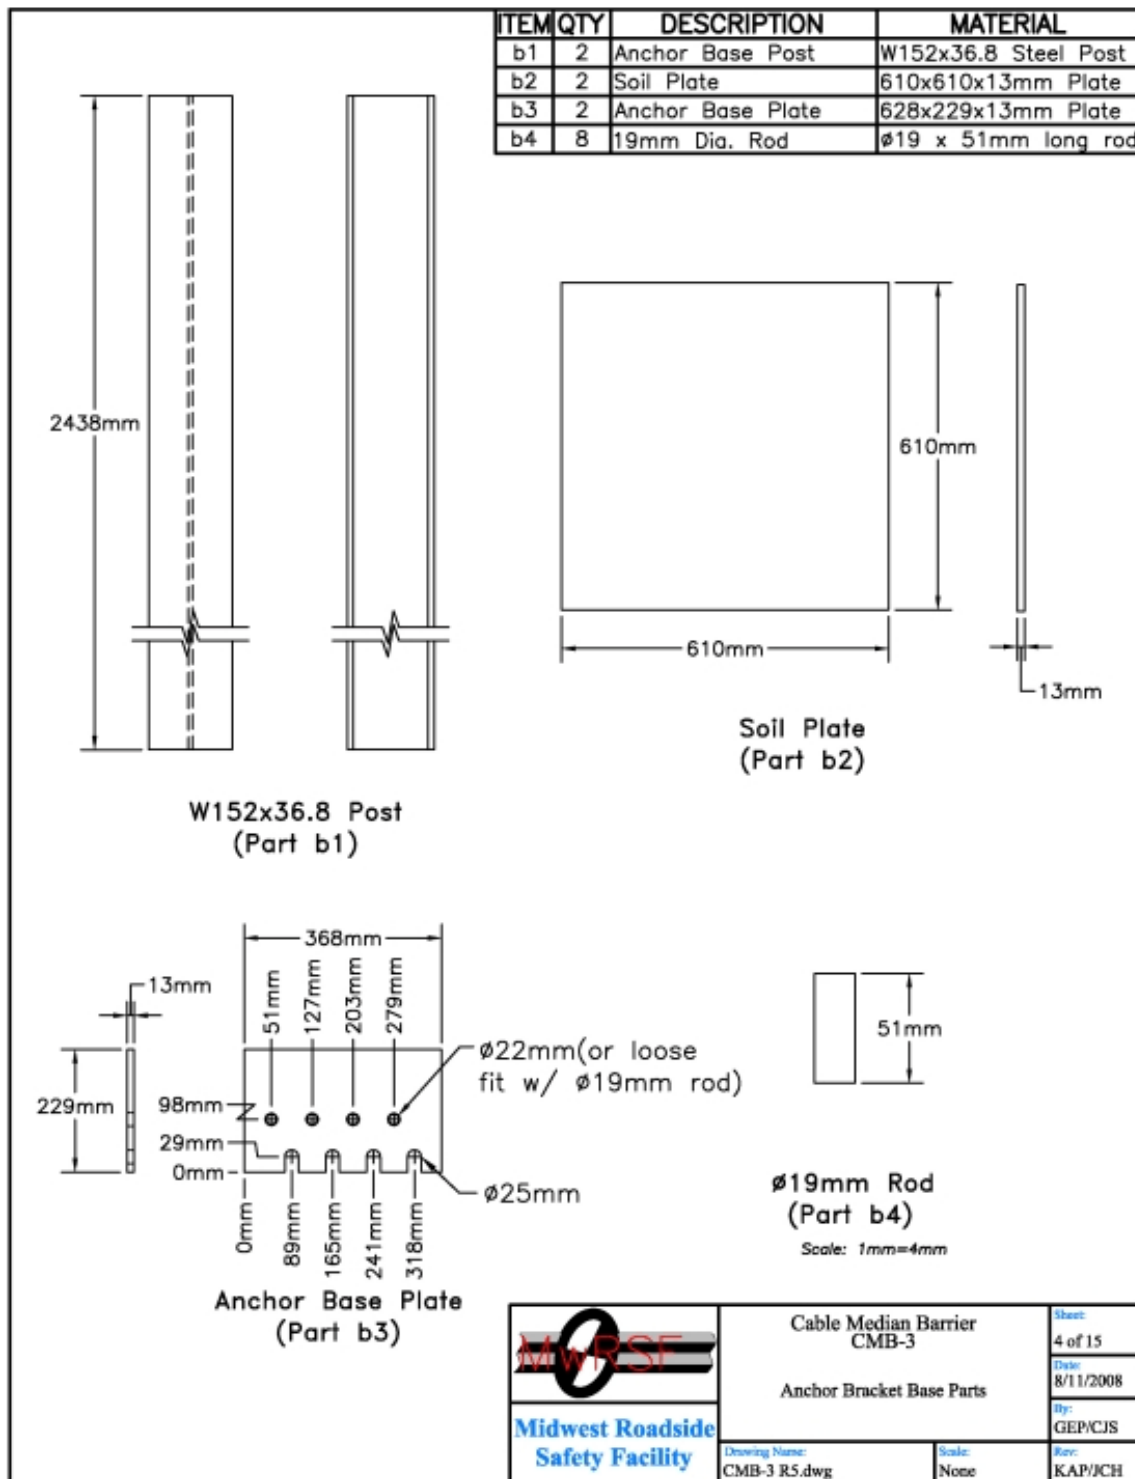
Anchor Bracket Base Parts (Metric), Design No. 3
